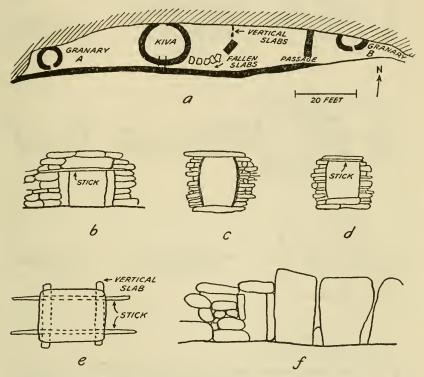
Details of house structures at site 6 near Lake Canyon and site 22, Rock Creek.
